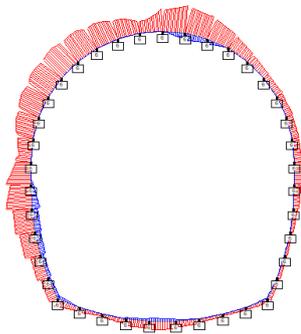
Stress in Concrete Lining due to Grouting Pressure during Construction
